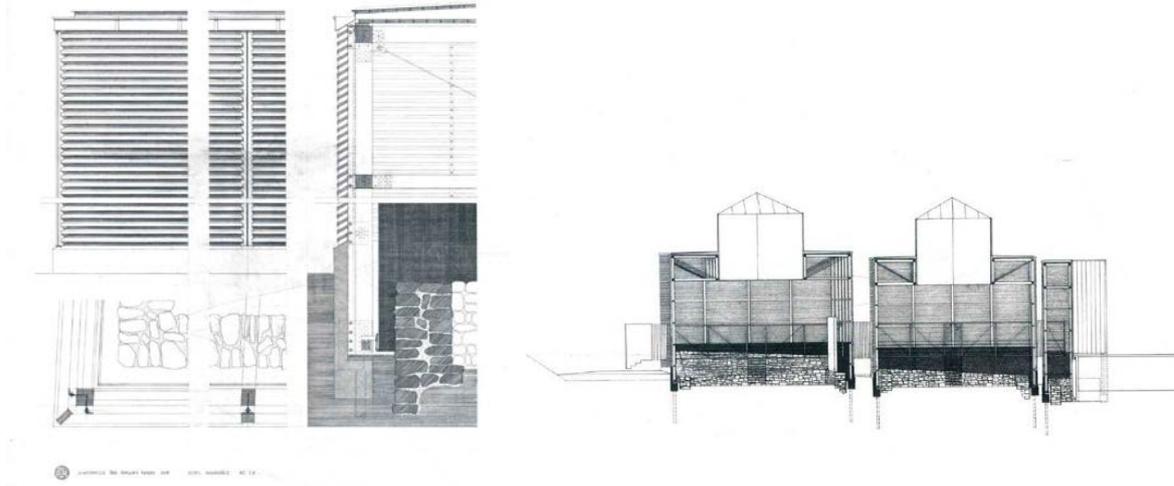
Material details & section (left), building section (right). *Buildings and Projects, Peter Zumthor, Volume 1, Page:38-39 & 42-43.
